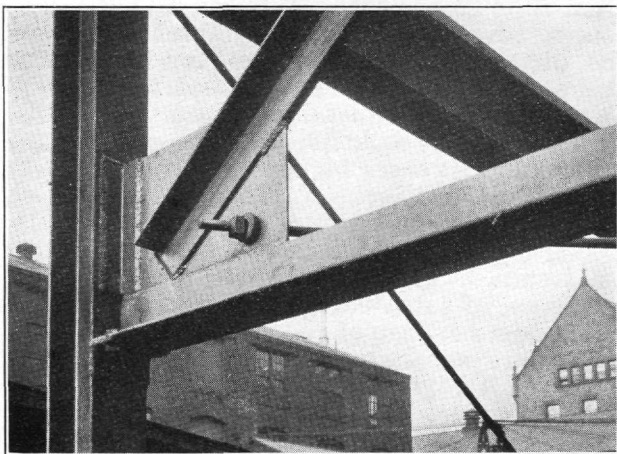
View of end gusset plate and joining of the truss to the column.
